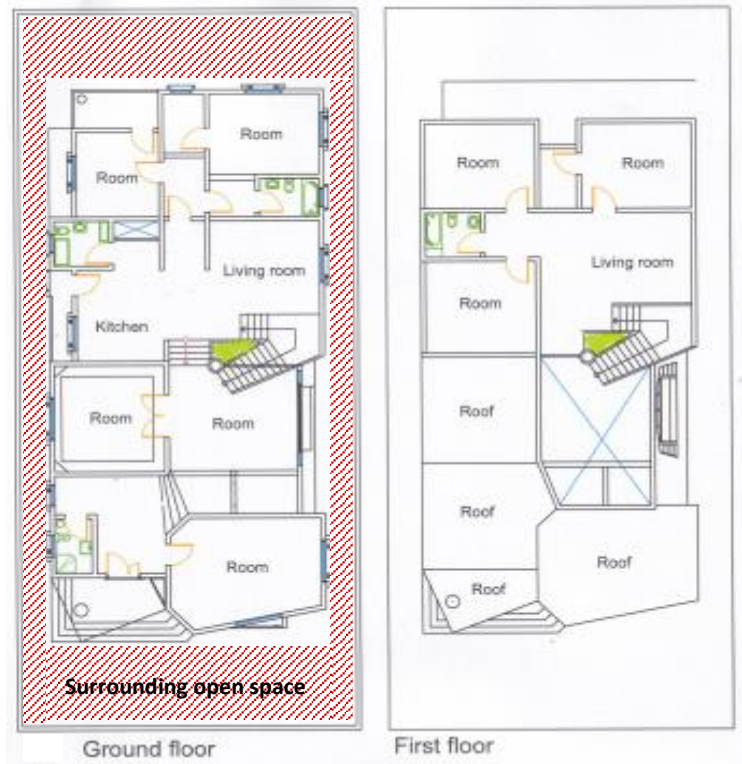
plan of the private house with an outdoor open space surrounding the building
